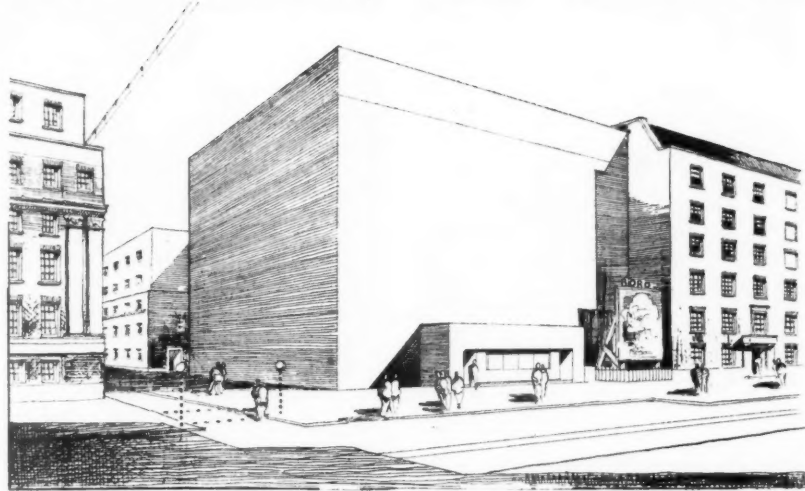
Heavily protected rest centre and shelter. Built with 4 ft. 6 in. mass concrete outside walls and 10 in. concrete roof with reinforcement near the underside. There is also a thick base. There are six storeys, making the fullest use of the heavy protection. The two lower floors are used as a rest centre, the other four as shelters with separate canteens.
